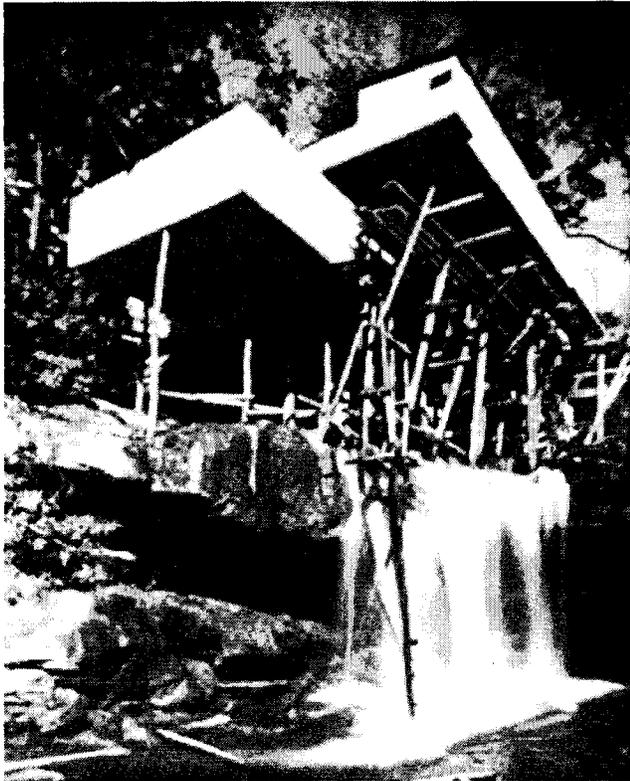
Hall's storage shanty at the master terrace in place while form sides and bottoms are stripped and re-shored prior to 28 day strength of concrete.
